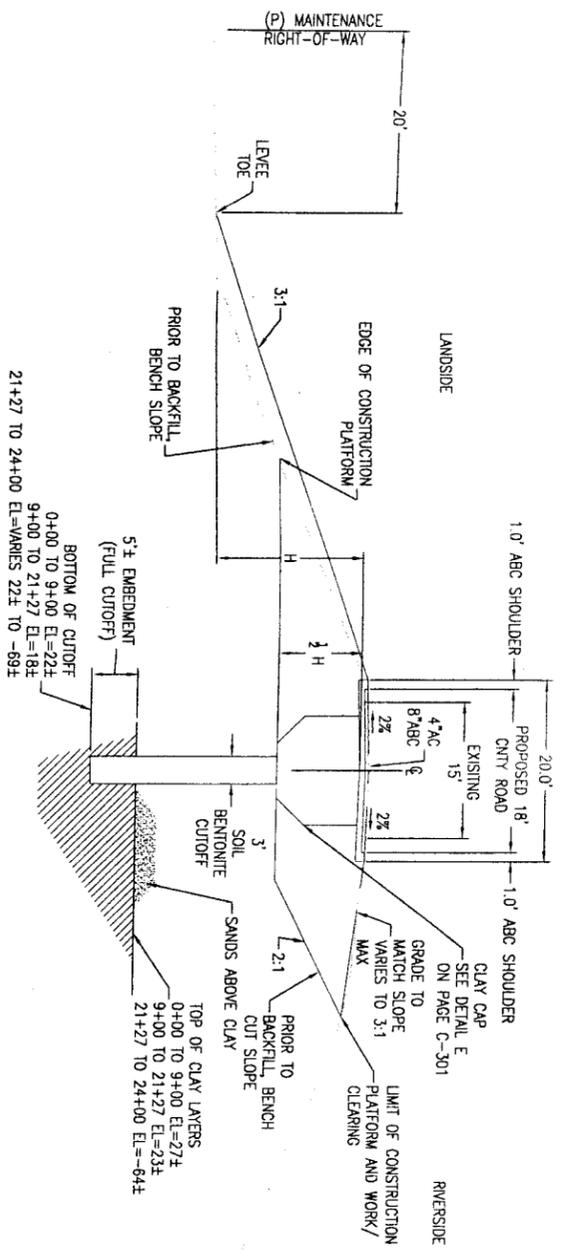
Typical Cross Section of Slurry Cutoff Wall, Site 10
